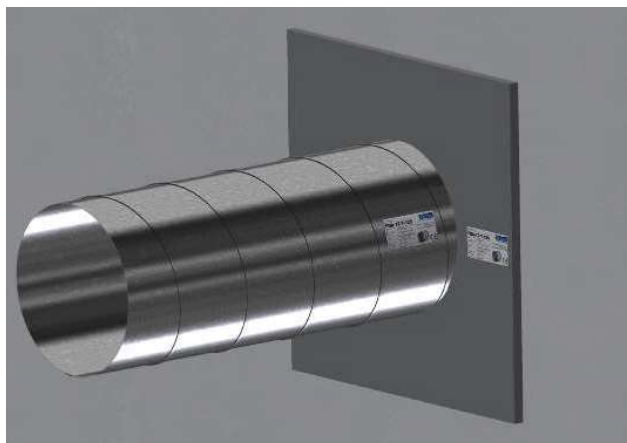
FDA-BU, fire damper. - suggested labelling layout.
